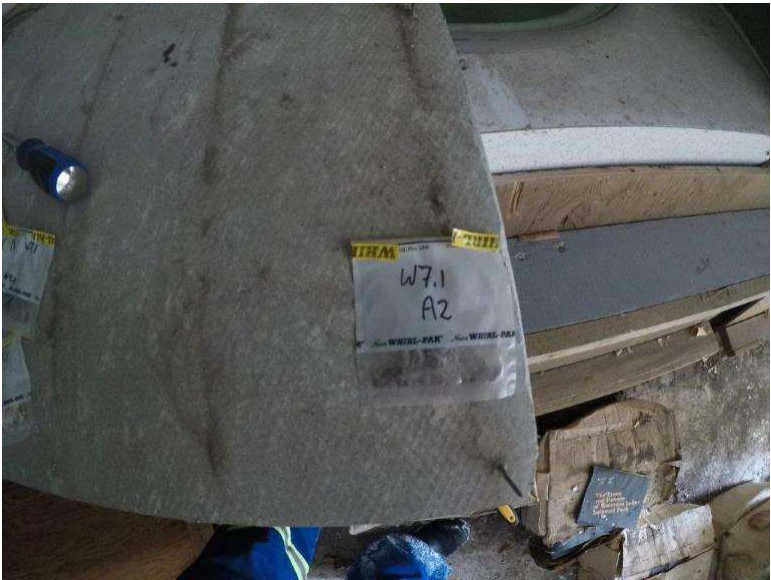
Site 7.1 Waterton Townsite Campground Washroom #2
